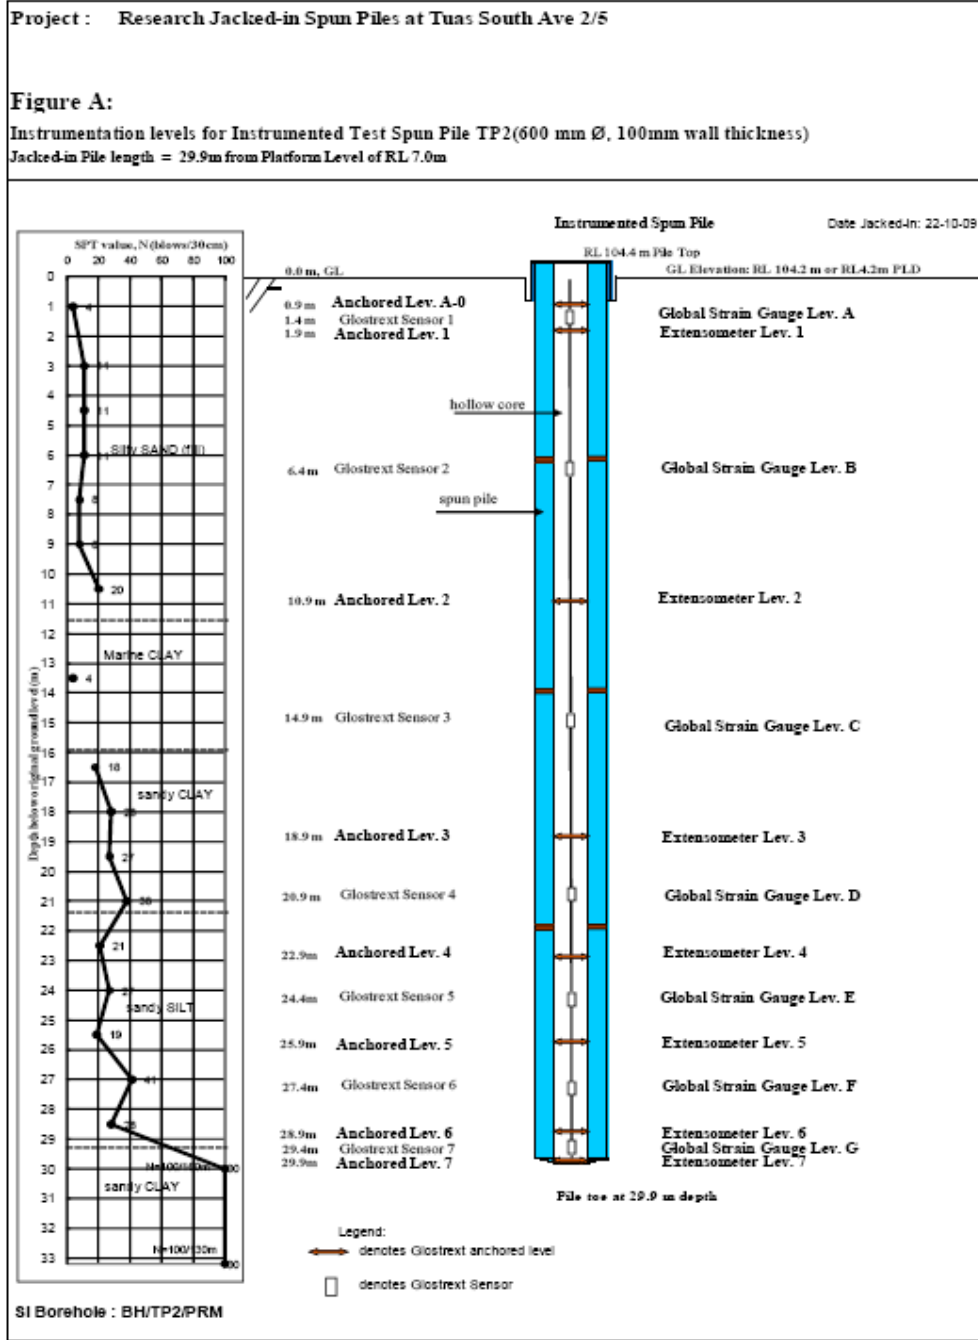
Instrumentation levels for Instrumented Test Pile TP2
